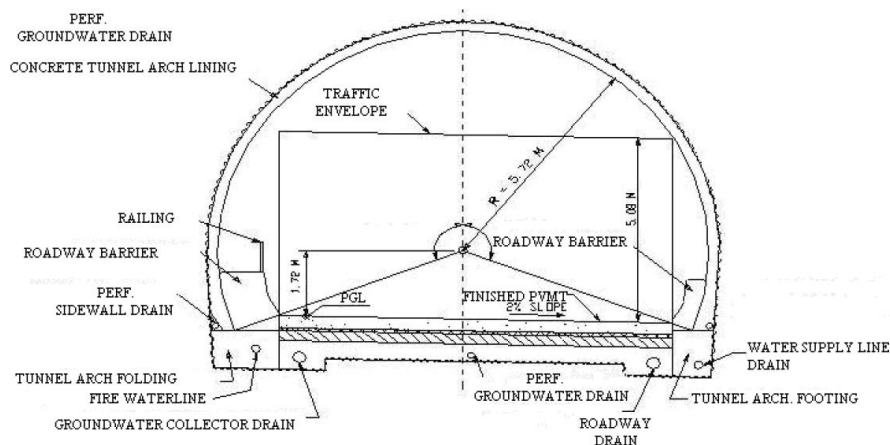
Typical Two-Lane Road Tunnel Cross Section and Elements (FHWA, 2009)
